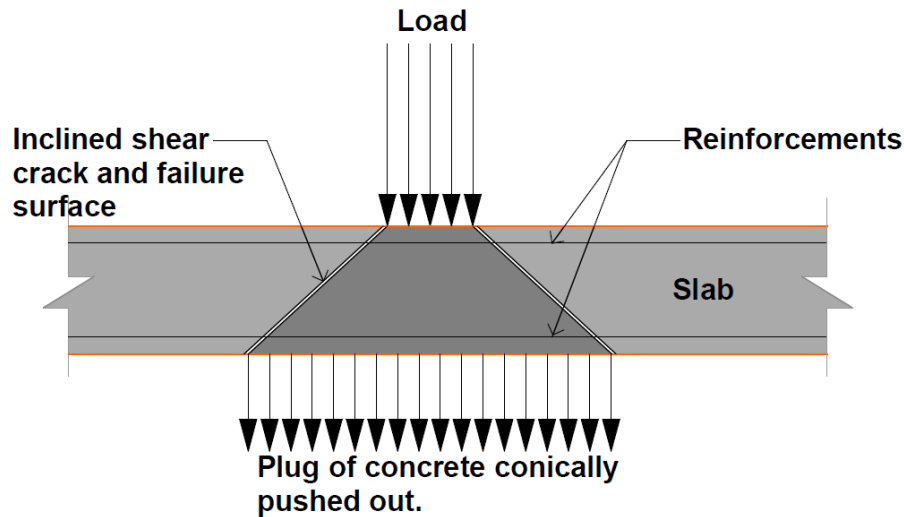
Punching shear failure section in concrete deck due to concentrated load
